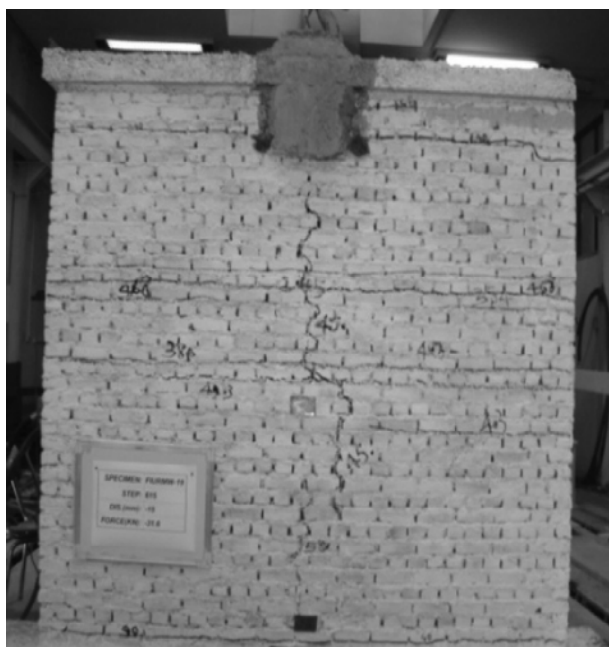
Crack pattern on flange side of FIURMW-19 (H-shaped at the end test).
